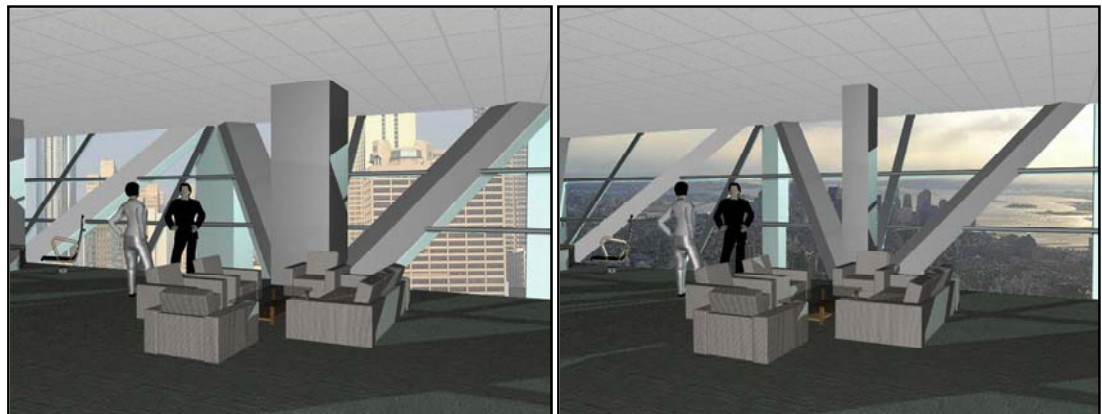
(a) A view at another lower floor of the horizontal folded façade building;
